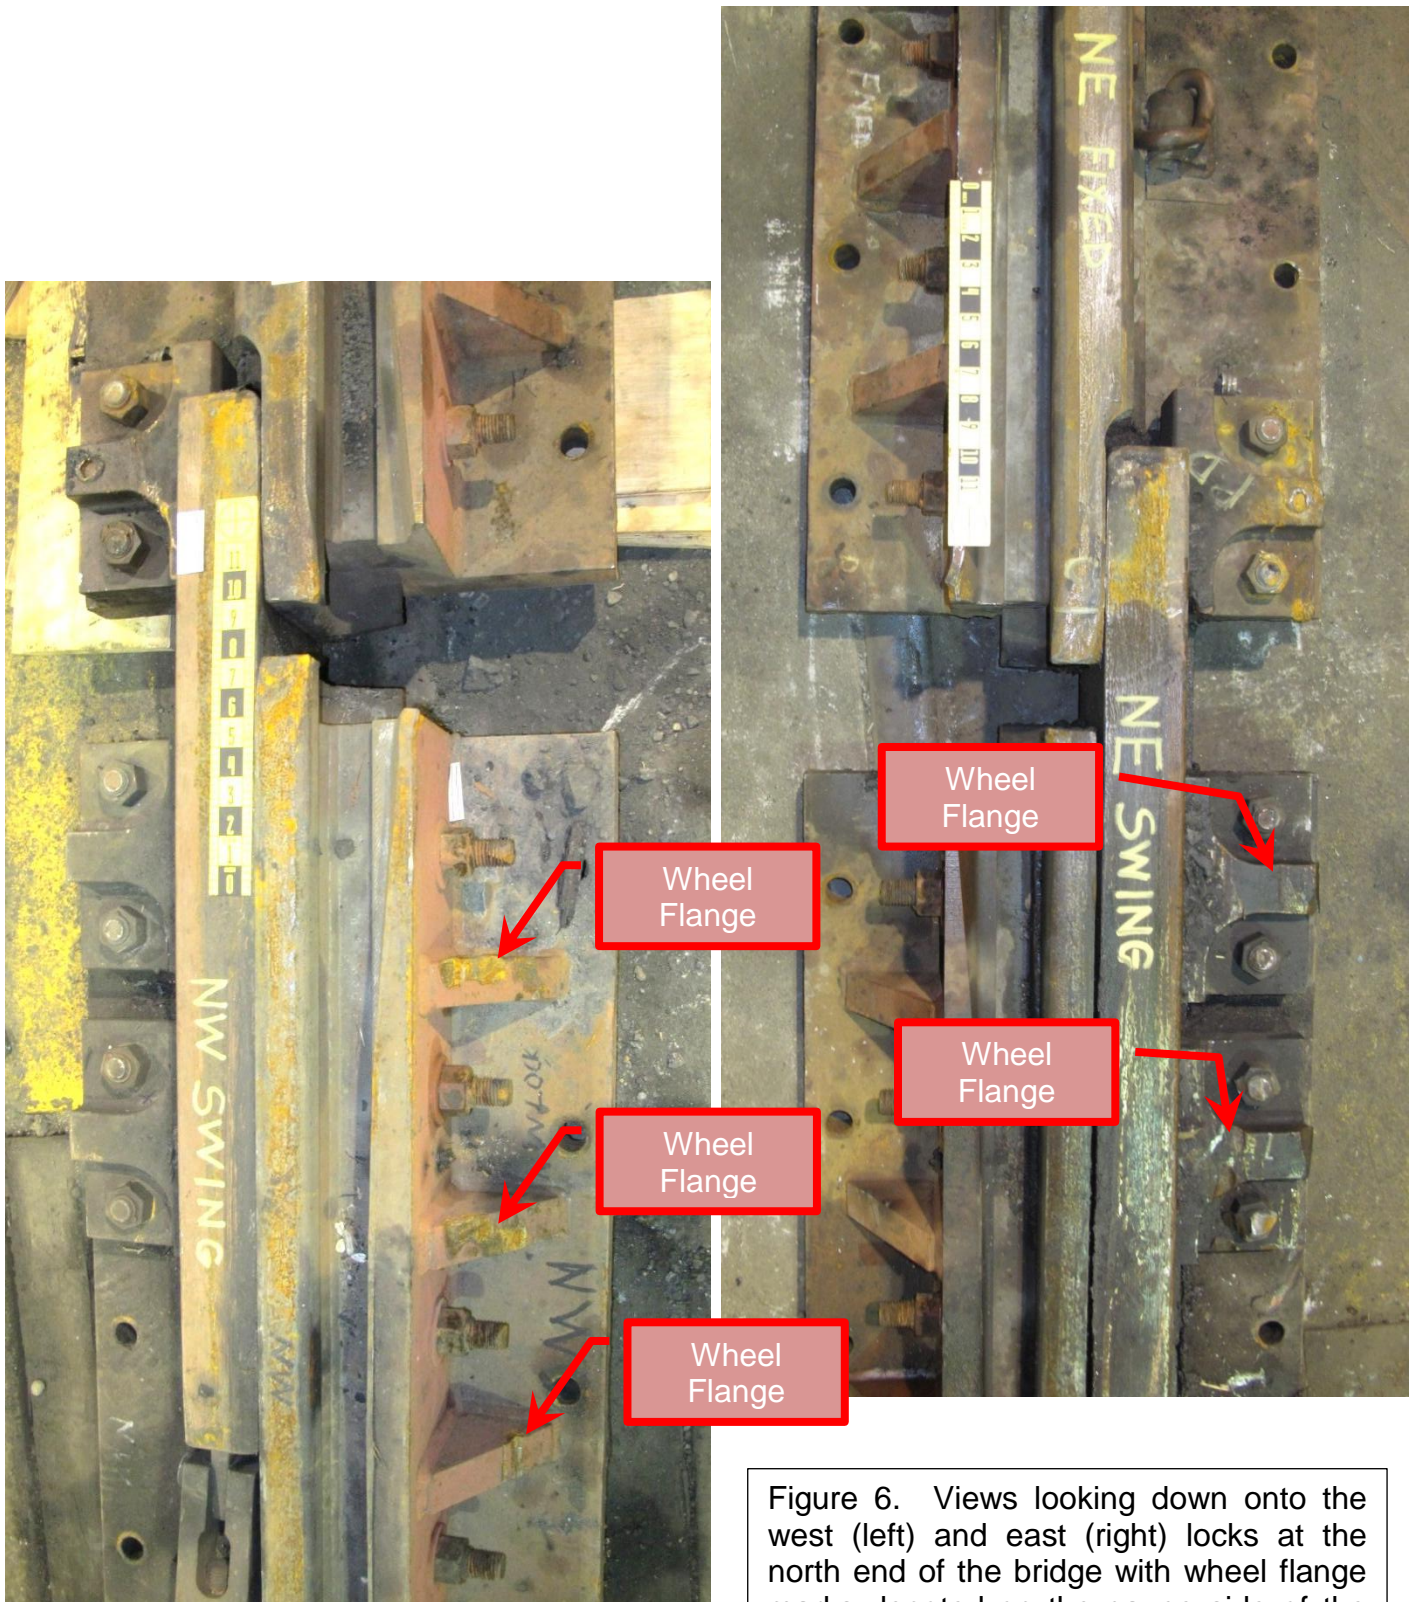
Views looking down onto the west (left) and east (right) locks at the north end of the bridge with wheel flange marks denoted on the gauge side of the west rail and field side of the east rail.
